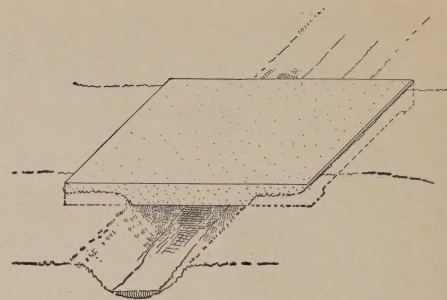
A simple reinforced concrete slab for bridging over a ditch at the side of the road. The sizes given in the table at the left may be used for this slab by omitting the sidewalls.
